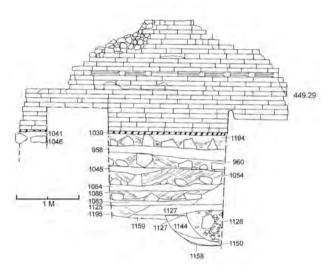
Elevation of the western wall of the South Temple above the eastern section of Test Pit 1 showing the fills of the temple foundations.
